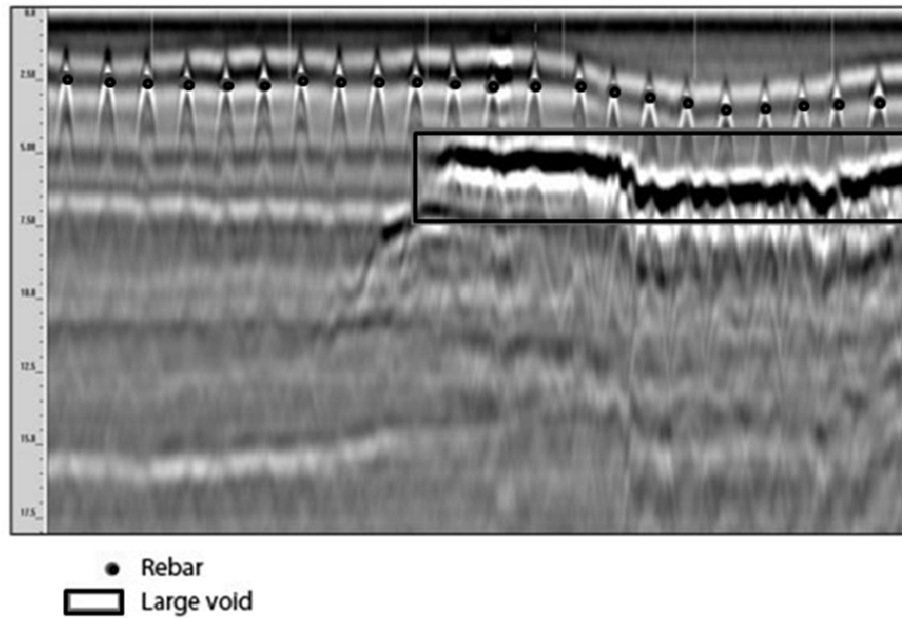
Plot showing highway void as well as the reinforcing bars (rebar) used in the fabrication of the roadbed. (Courtesy of Geophysical Survey Systems, Inc. Used with permission.)
